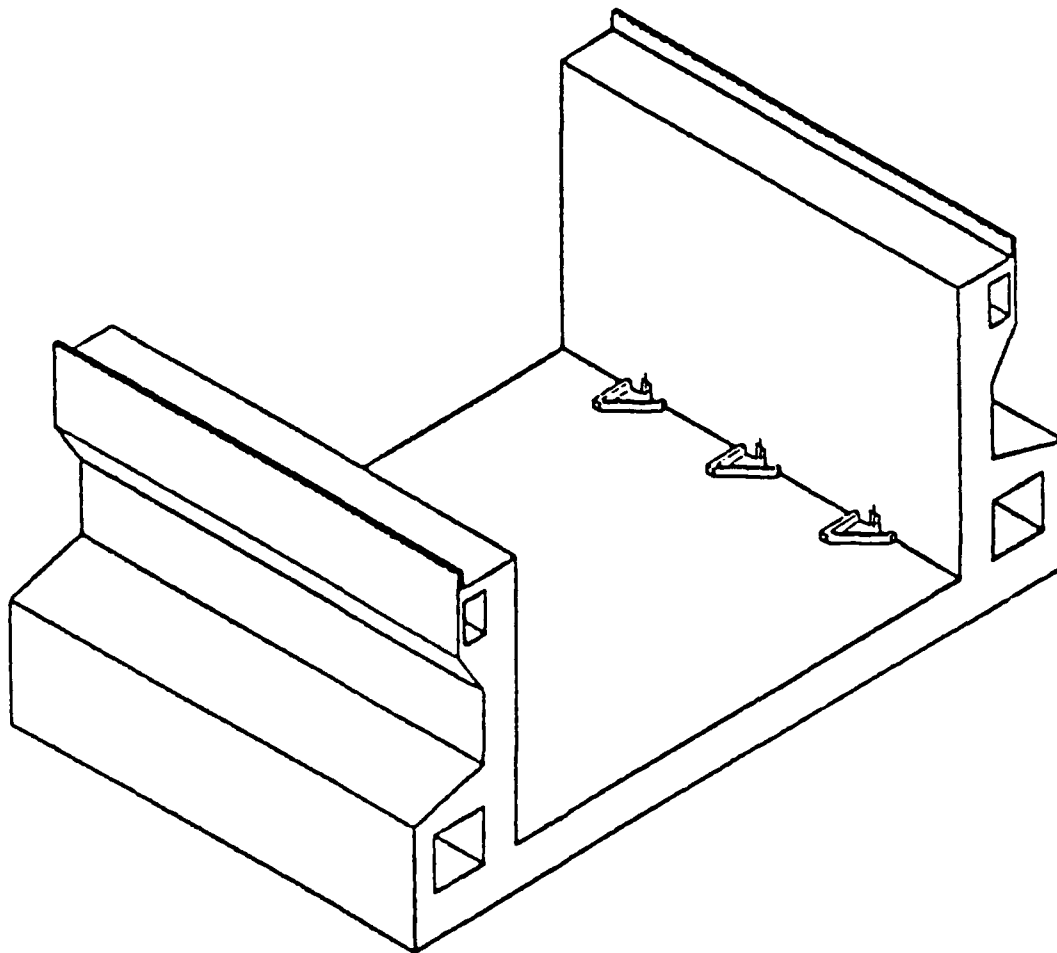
Three-dimensional view of auxiliary lock chamber for Lock and Dam 26R
